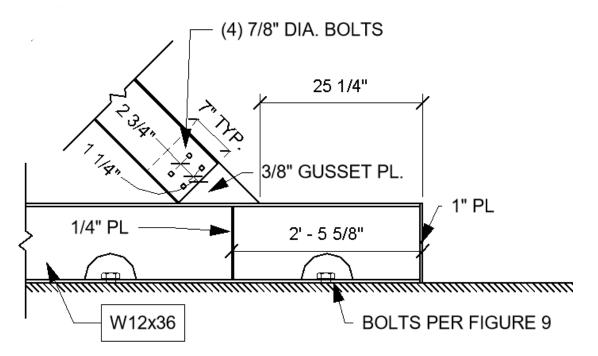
Detail D - Main Brace to Floor Beam Connection
